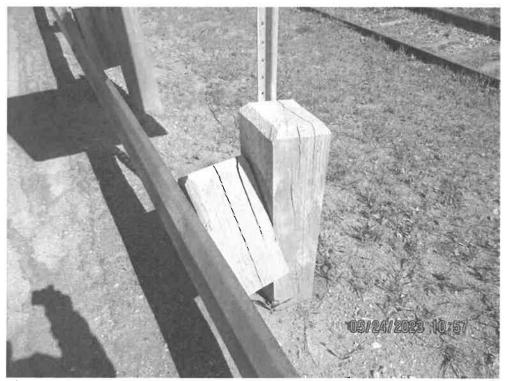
Rotated loose offset timber at guide rail post (typ.).
